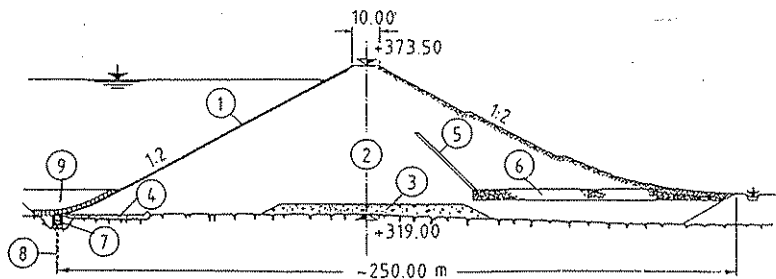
Typical section of a rockfill dam with face sealing of asphaltic concrete. Example Obernau dam, Germany 1972 (adapted from DNK & DVWK 1987).
